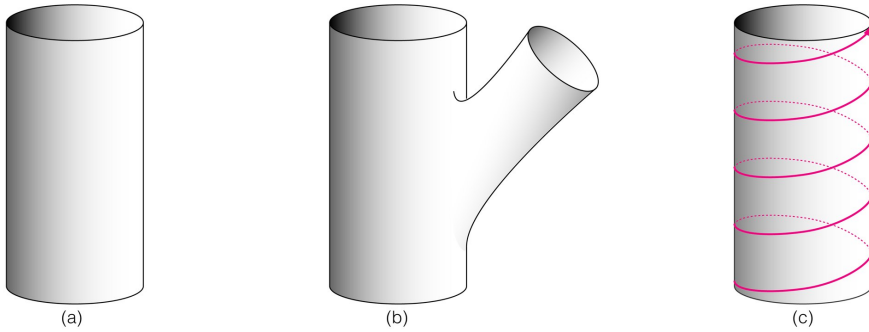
Filled moulds for (a) column components, (b) branching or nodal components and (c) reinforcement of filled mould.
